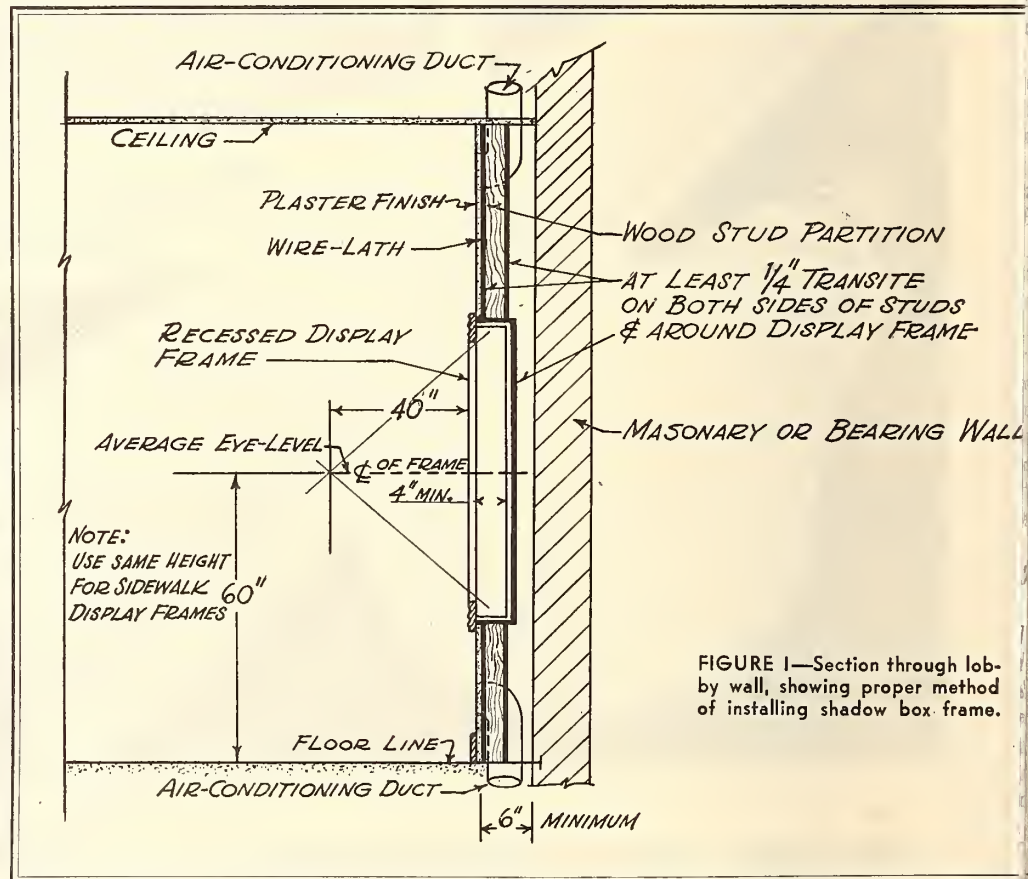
Section through lobby wall, showing proper method of installing shadow box frame.
